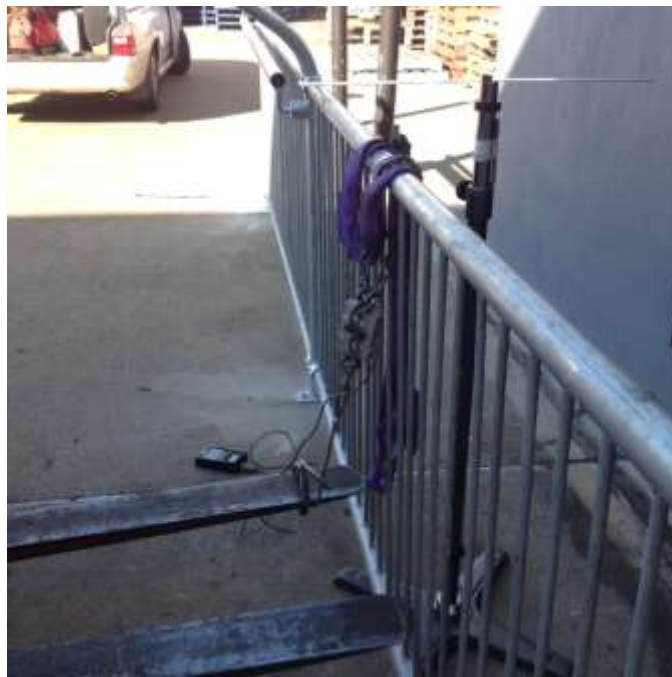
Test # 3 Pedestrian Panel 2.4mts Top rail
